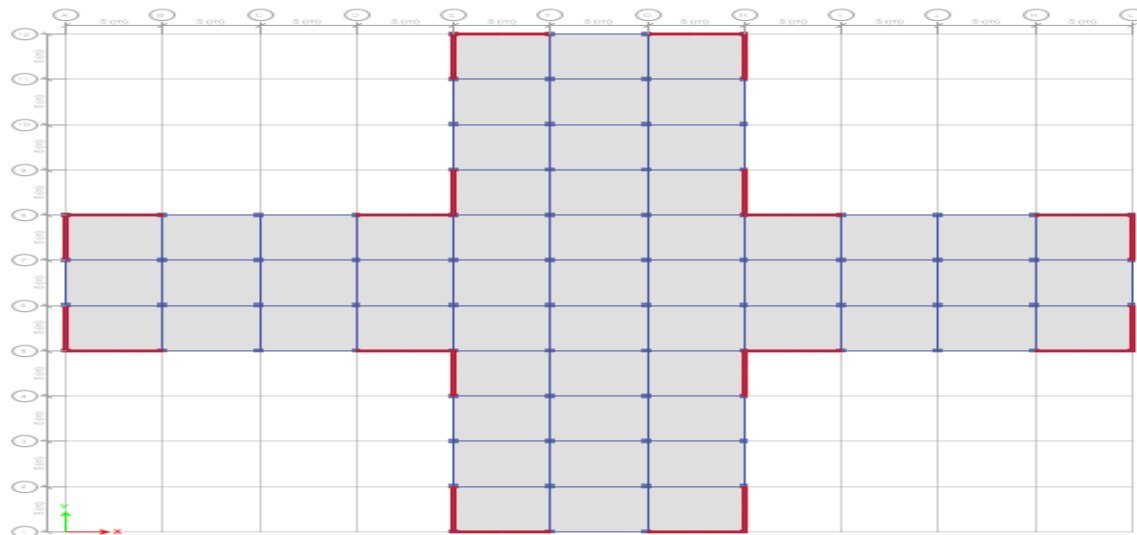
Plan view of plus shape with Shear wall at Corners with blast loading
